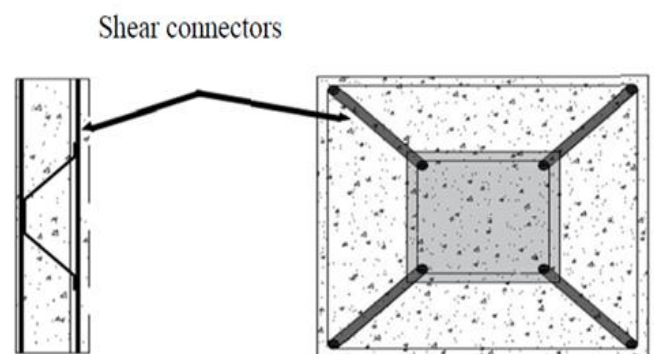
Profile of shear connectors between original column and jacket reinforcement
